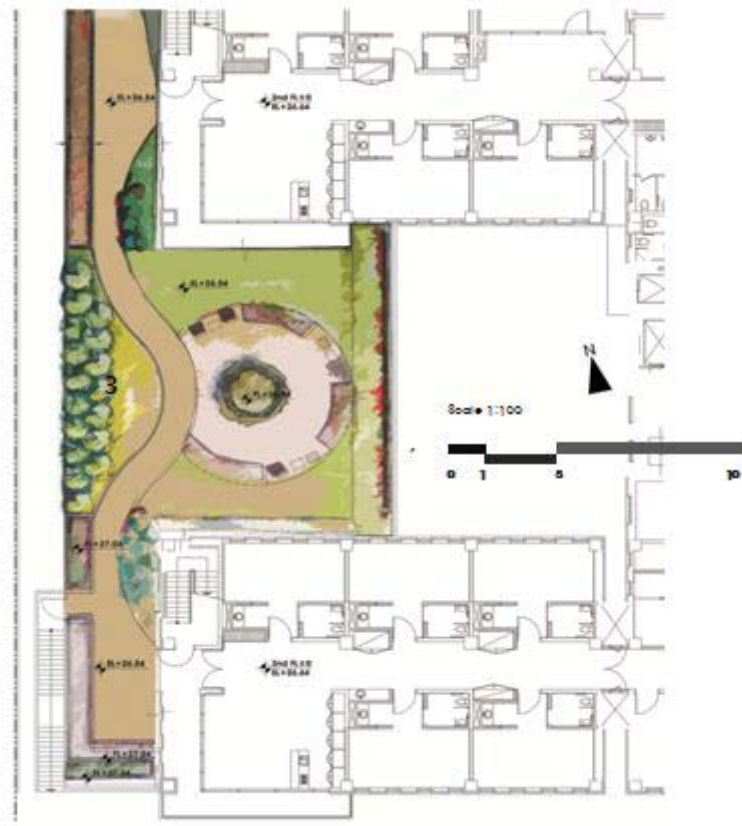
> Detail plan of Terrace garden–Meditation garden
